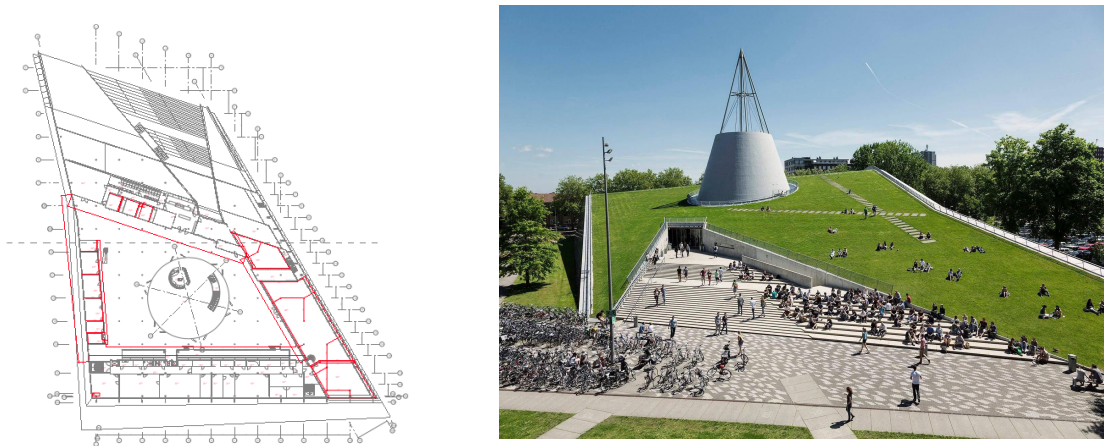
TU Delft library (right) and floor plan 1st floor (left)
